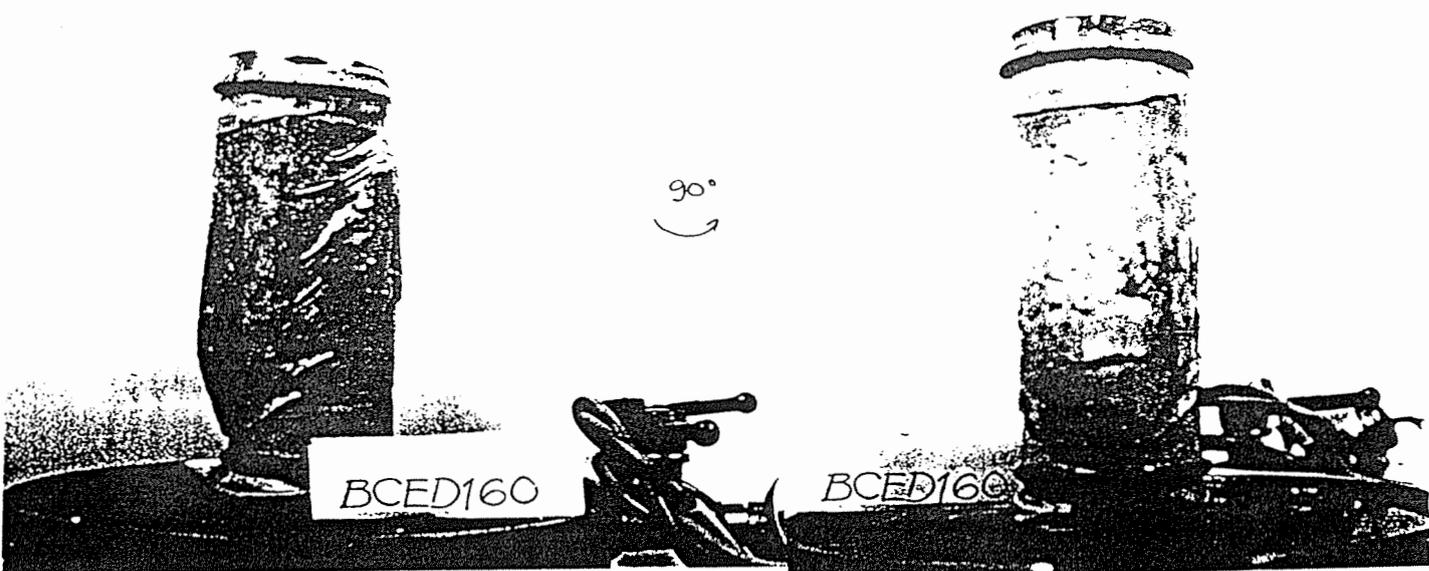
Improved-soil specimens after failure (source: SGI's archives).
